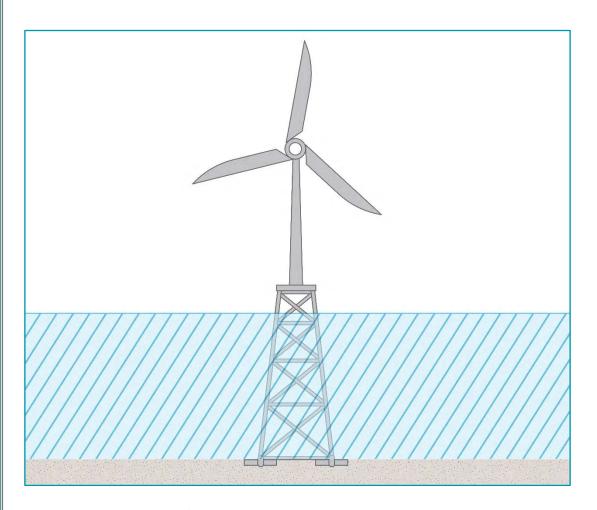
Example of a Jacket Foundation with Pin Piles.
